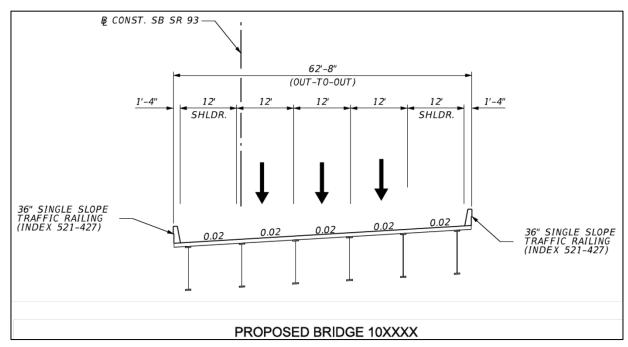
Typical Section of Proposed Southbound I-275 Bridge over C-D Road Ramp to I-75
